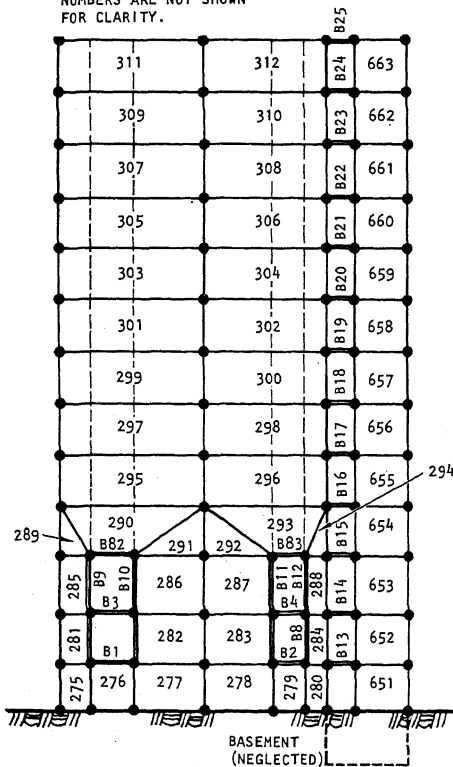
MESH ARRANGEMENT FOR SOUTH WALL (WALL 1)
